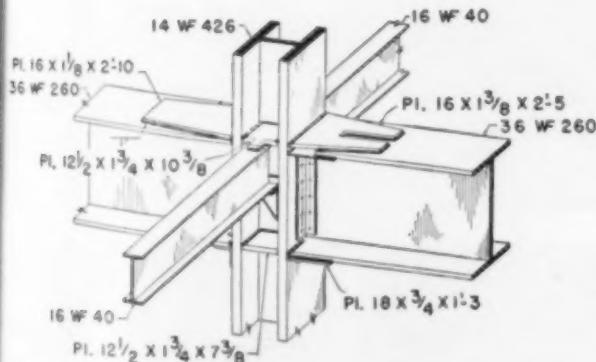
Framing details at third floor level of ten story addition to Register and Tribune Building. All holes are eliminated from main columns by fillet welding or plug welding erection brackets to web and erection angles to column flanges.
